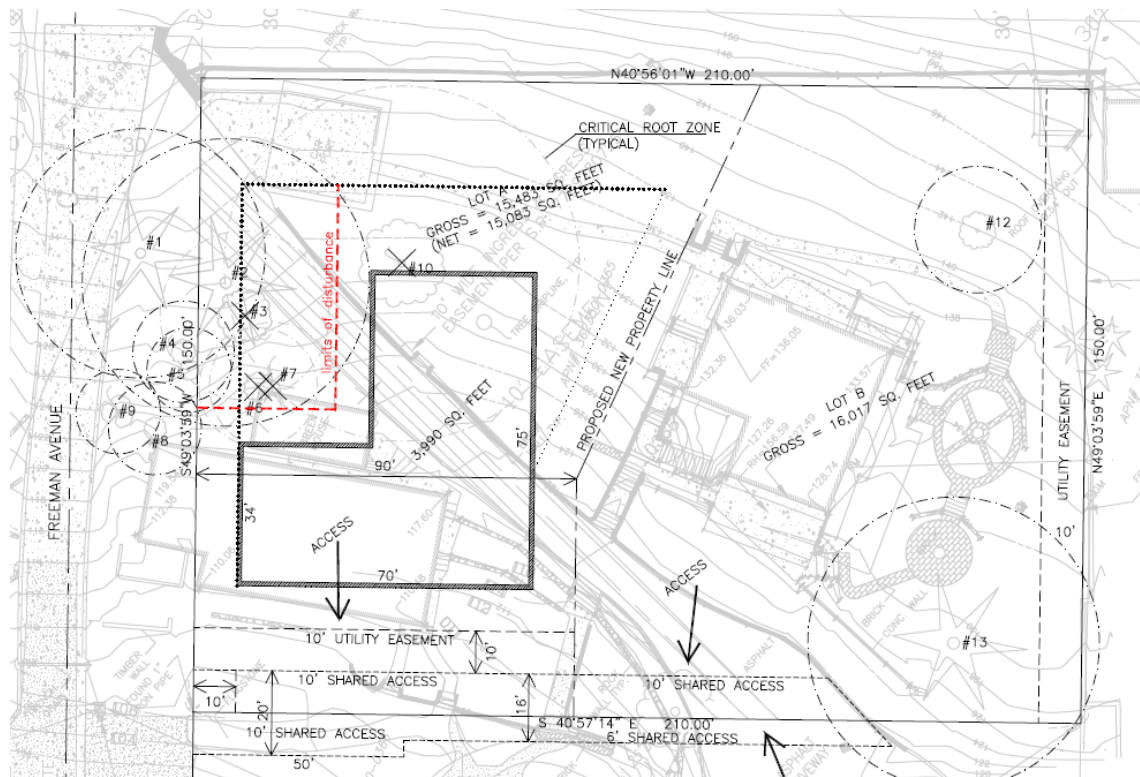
Excerpt from the proposed plan set showing the new property layout.
